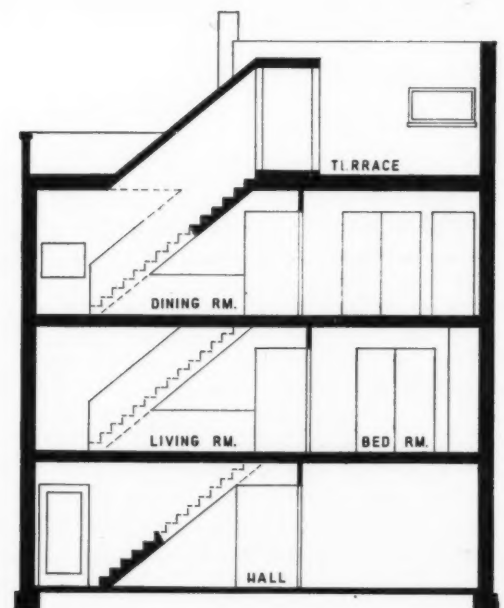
DETAIL SECTION, VERTICAL, THROUGH FLOOR, WALL, WINDOW AND ROOF TERRACE
